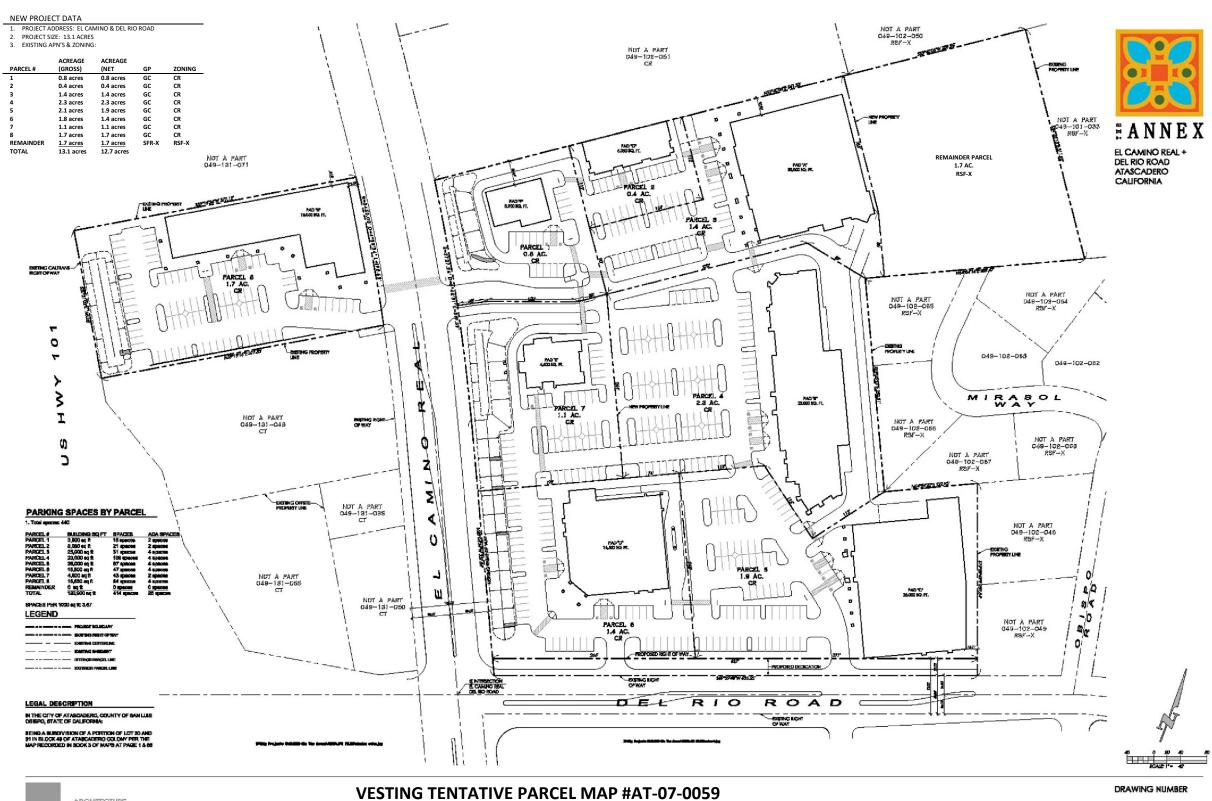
ANNEX PROJECT SITE CONCEPTUAL SITE PLAN
